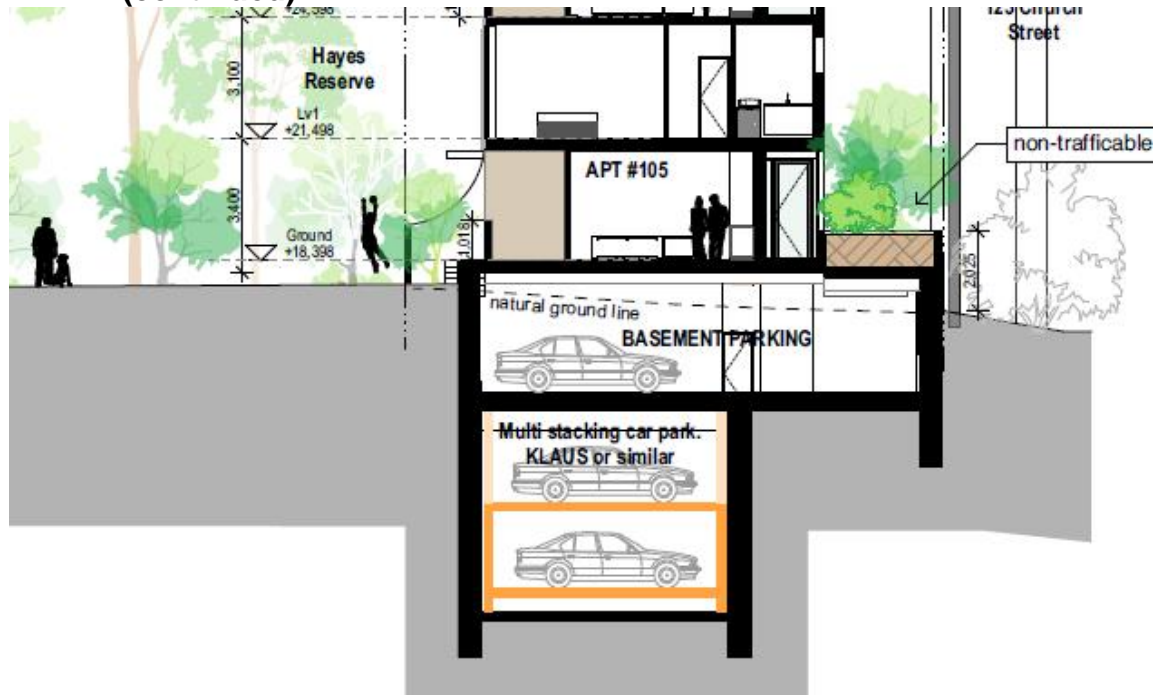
Cross Section of the multi-stacker parking for 12 resident's car spaces over 2 levels.
